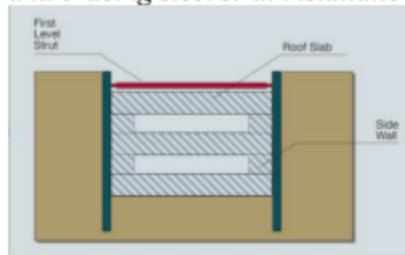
Stage 2- Excavation and bracing steel strut installation
